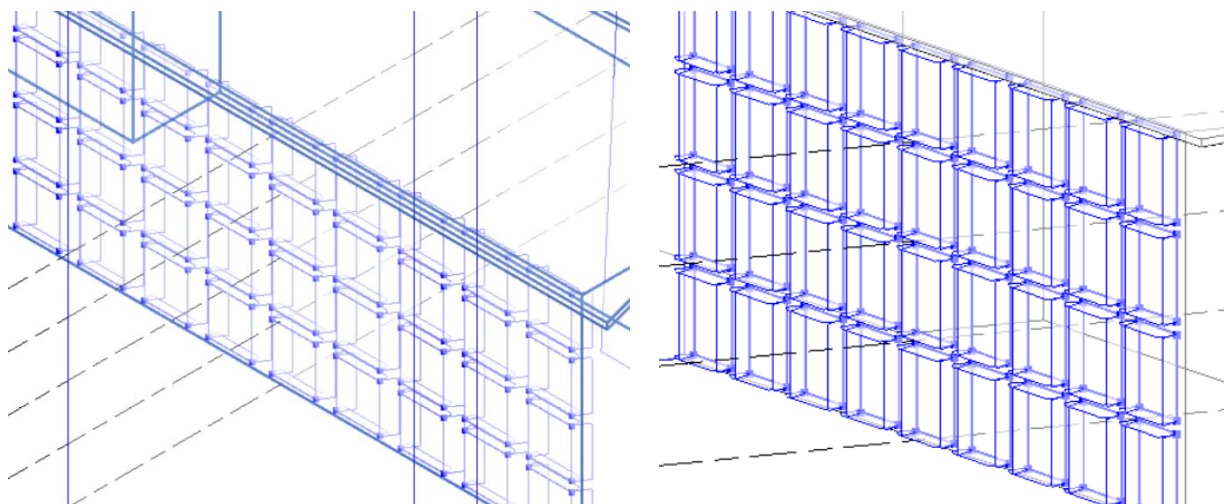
Facade with elements when the script was run. Because of wrong mass wall coordinates in Revit the elements are facing inside the building (1<sup>st</sup> picture), after the issue was fixed elements started facing outside (2<sup>nd</sup> picture).
